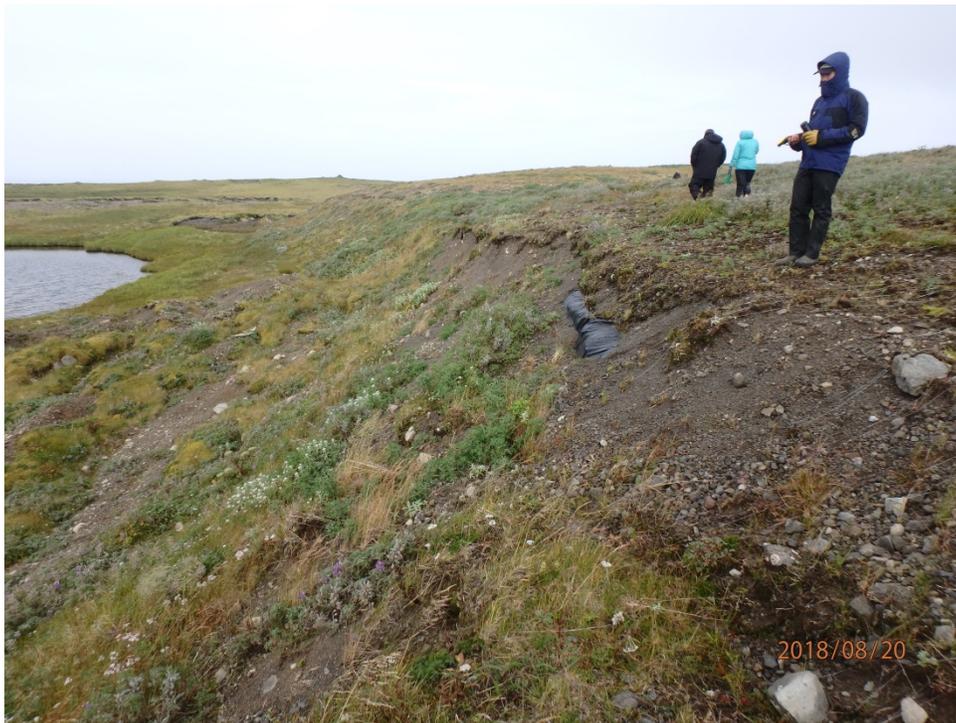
Exposed liner on the east side of the Drill Site D mud pit cap, similar to photo PL-D023 in the 2017 Amchitka inspection report (DOE 2017) and photo IMG_744 in the 2016 Amchitka inspection report (DOE 2016)
